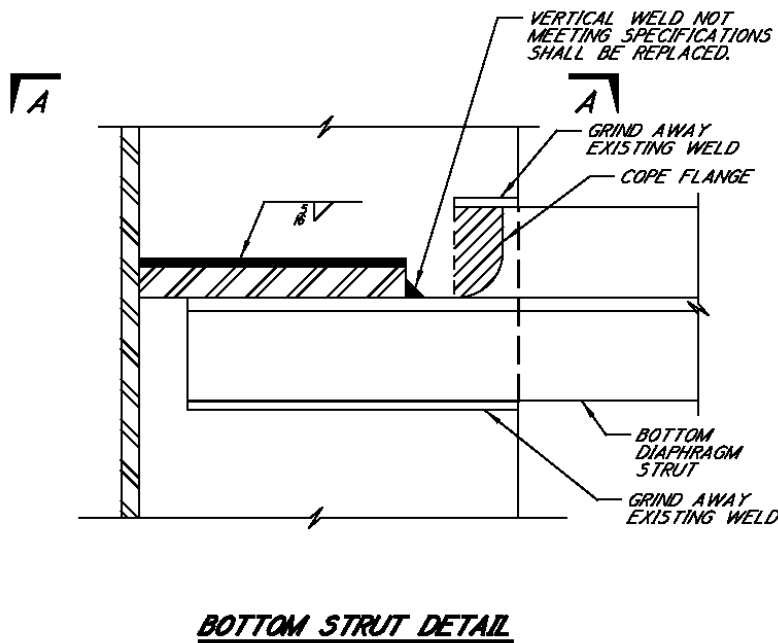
Retrofit at diaphragm bottom strut connection to bottom flange
